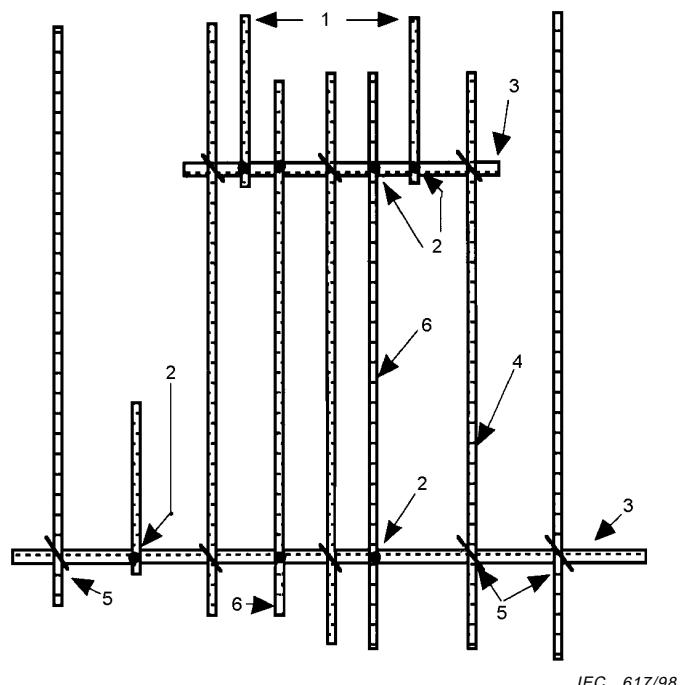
Clamps used as joints for reinforcing rods and strip iron conductors
